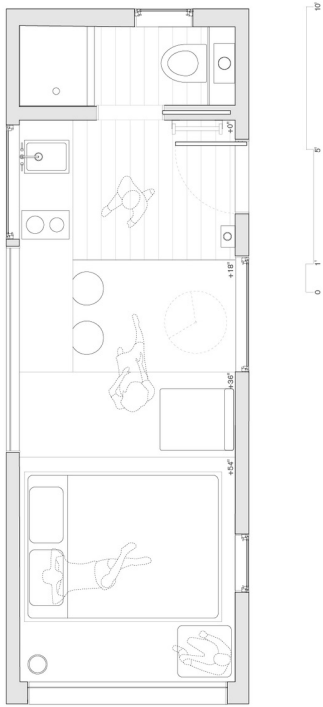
Getaway Cabin No.3, Floorplan (Getaway, 2016)
